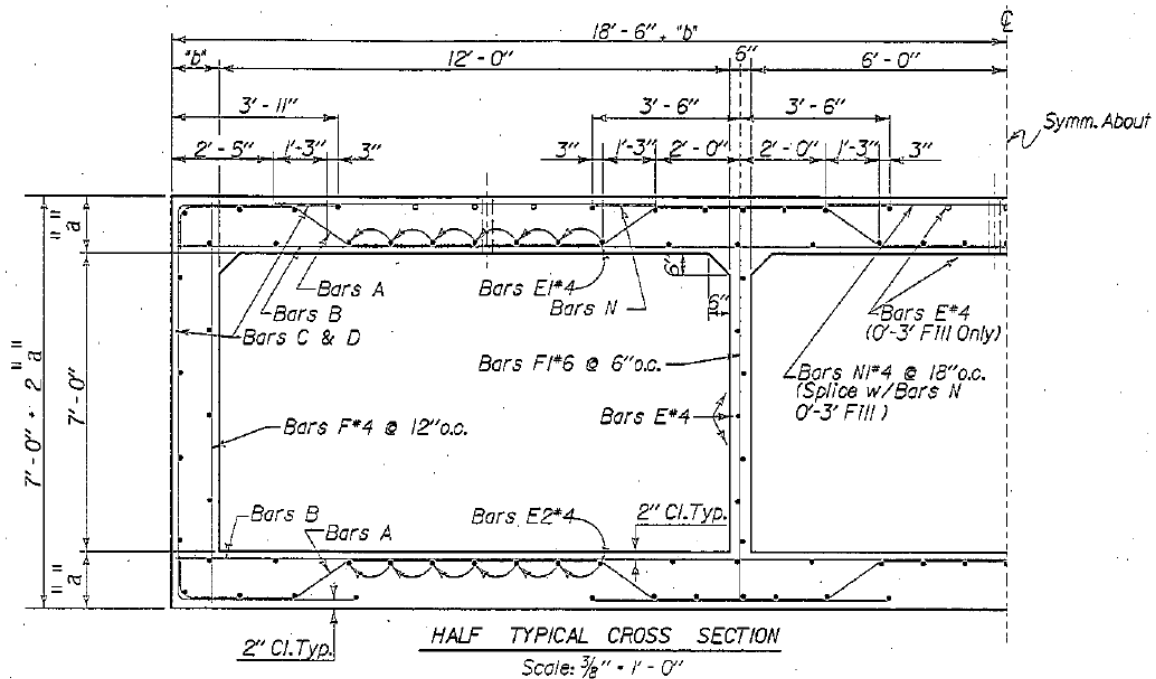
Centreville Culvert at 1808+98 Cross Section (ALDOT 2007)
